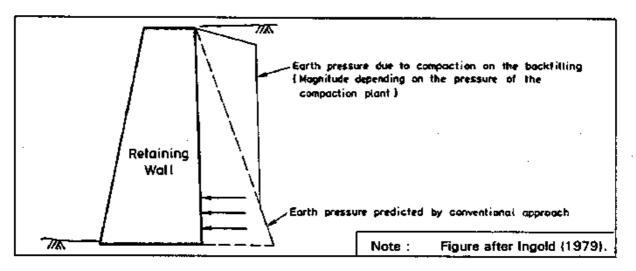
Pressure on Retaining Wall with Compacted Backfill
